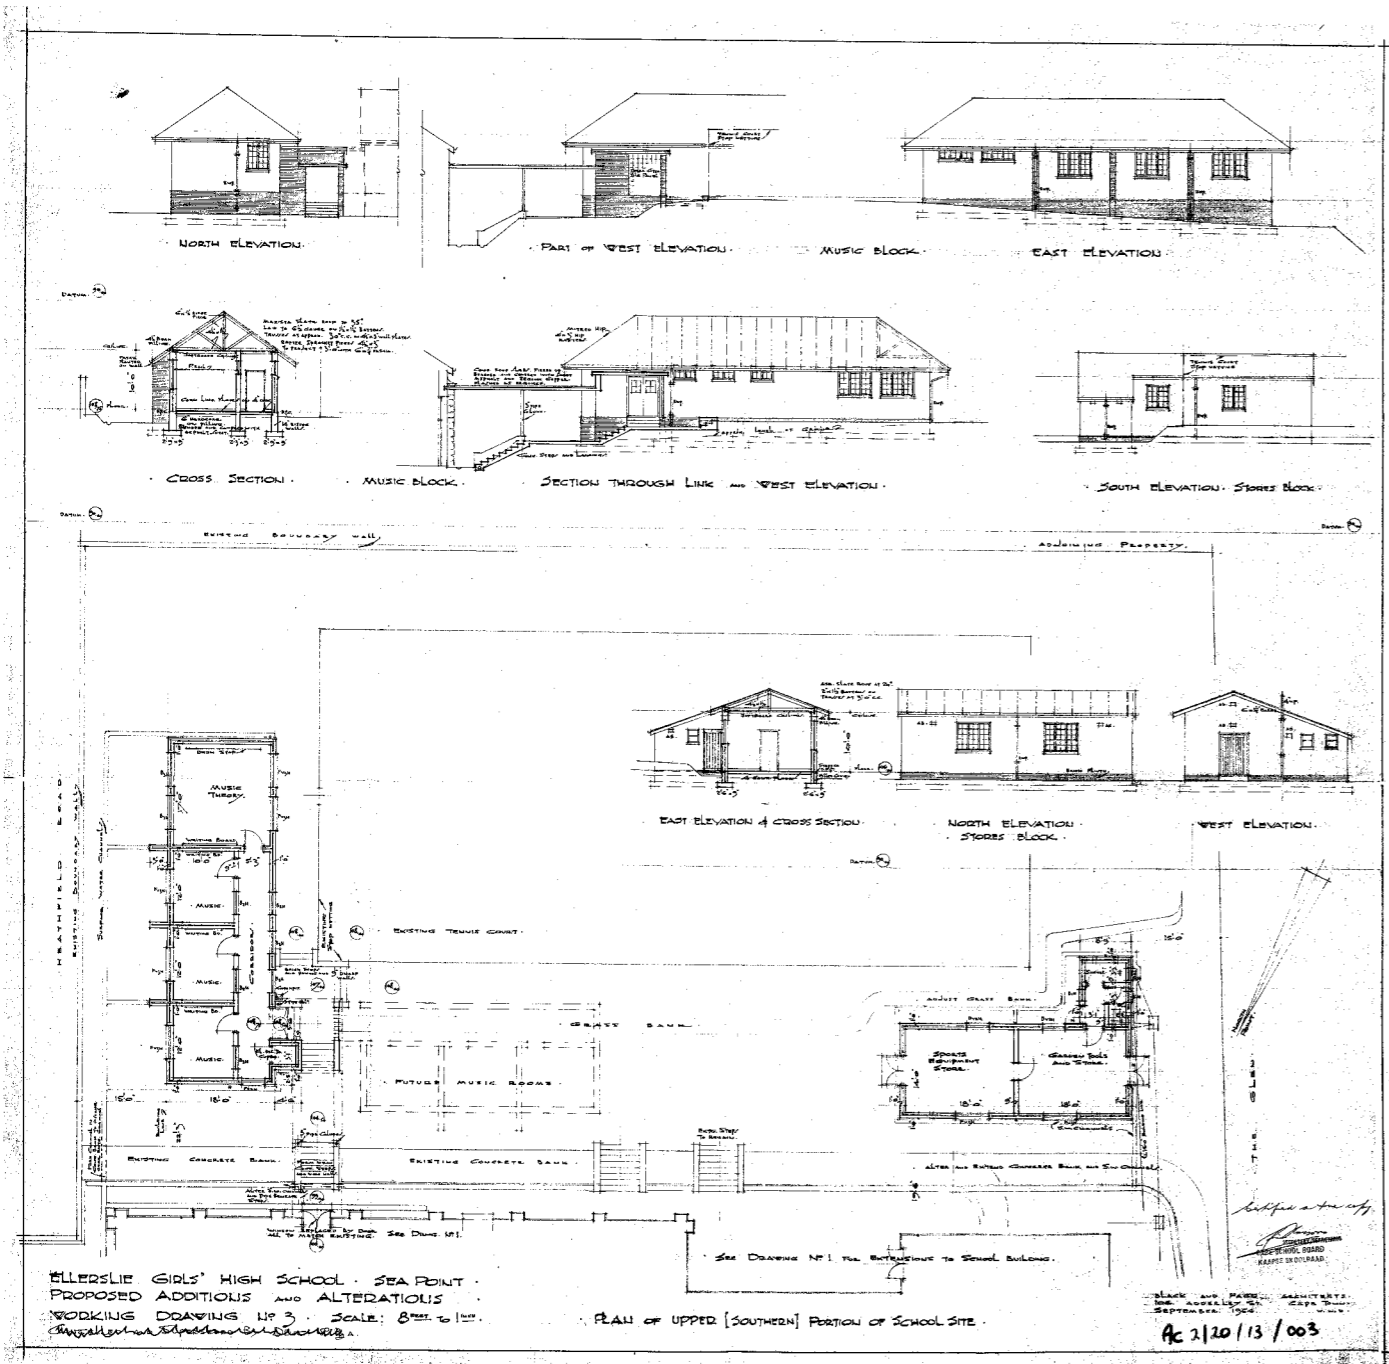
Music Room elevations, Black and Fagg Architects , 1964 (WCG Archive, 2023)
